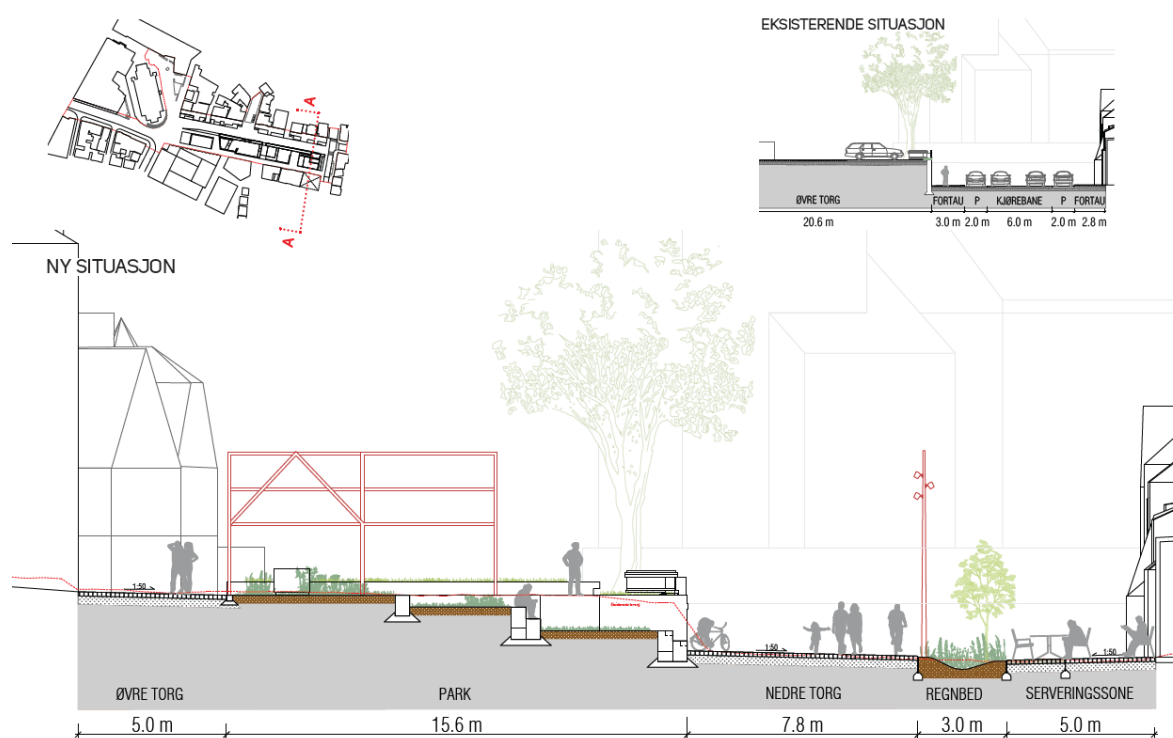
Nytorget – proposed plan (Section A) (source: Ghilardi+Hellsten Architects)
